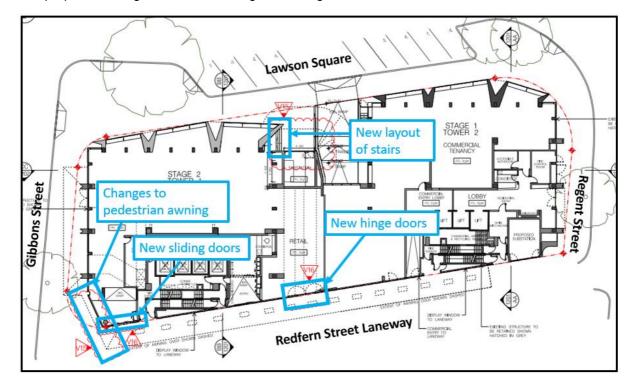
| Proposed ground floor changes (Base source: Applicant)
